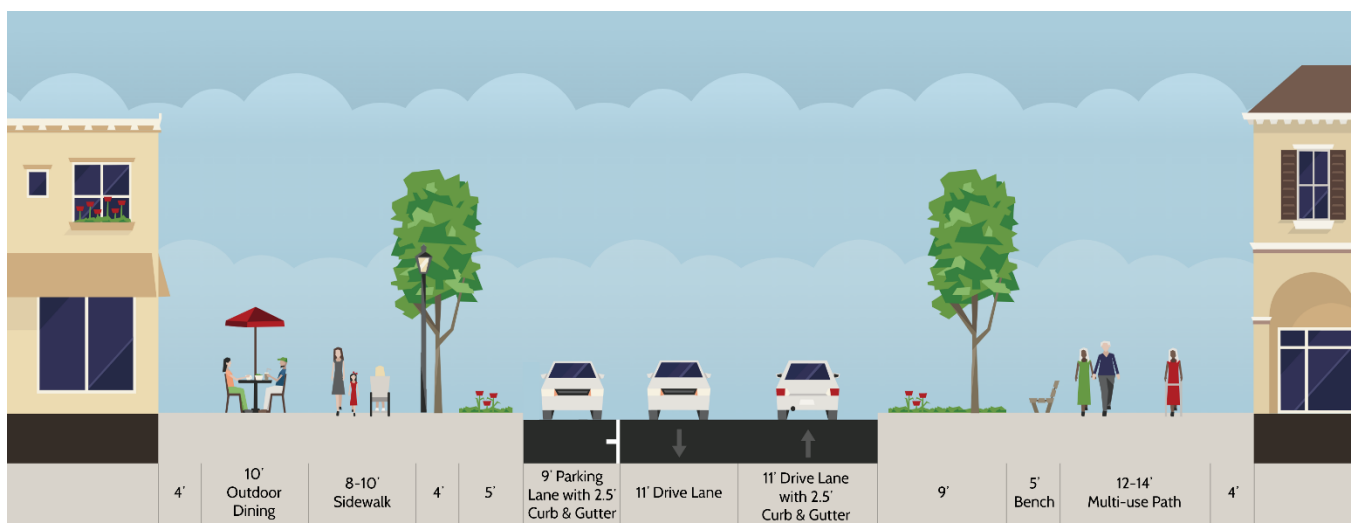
Typical Section for Local Street in Activity Center with Multiuse Path
